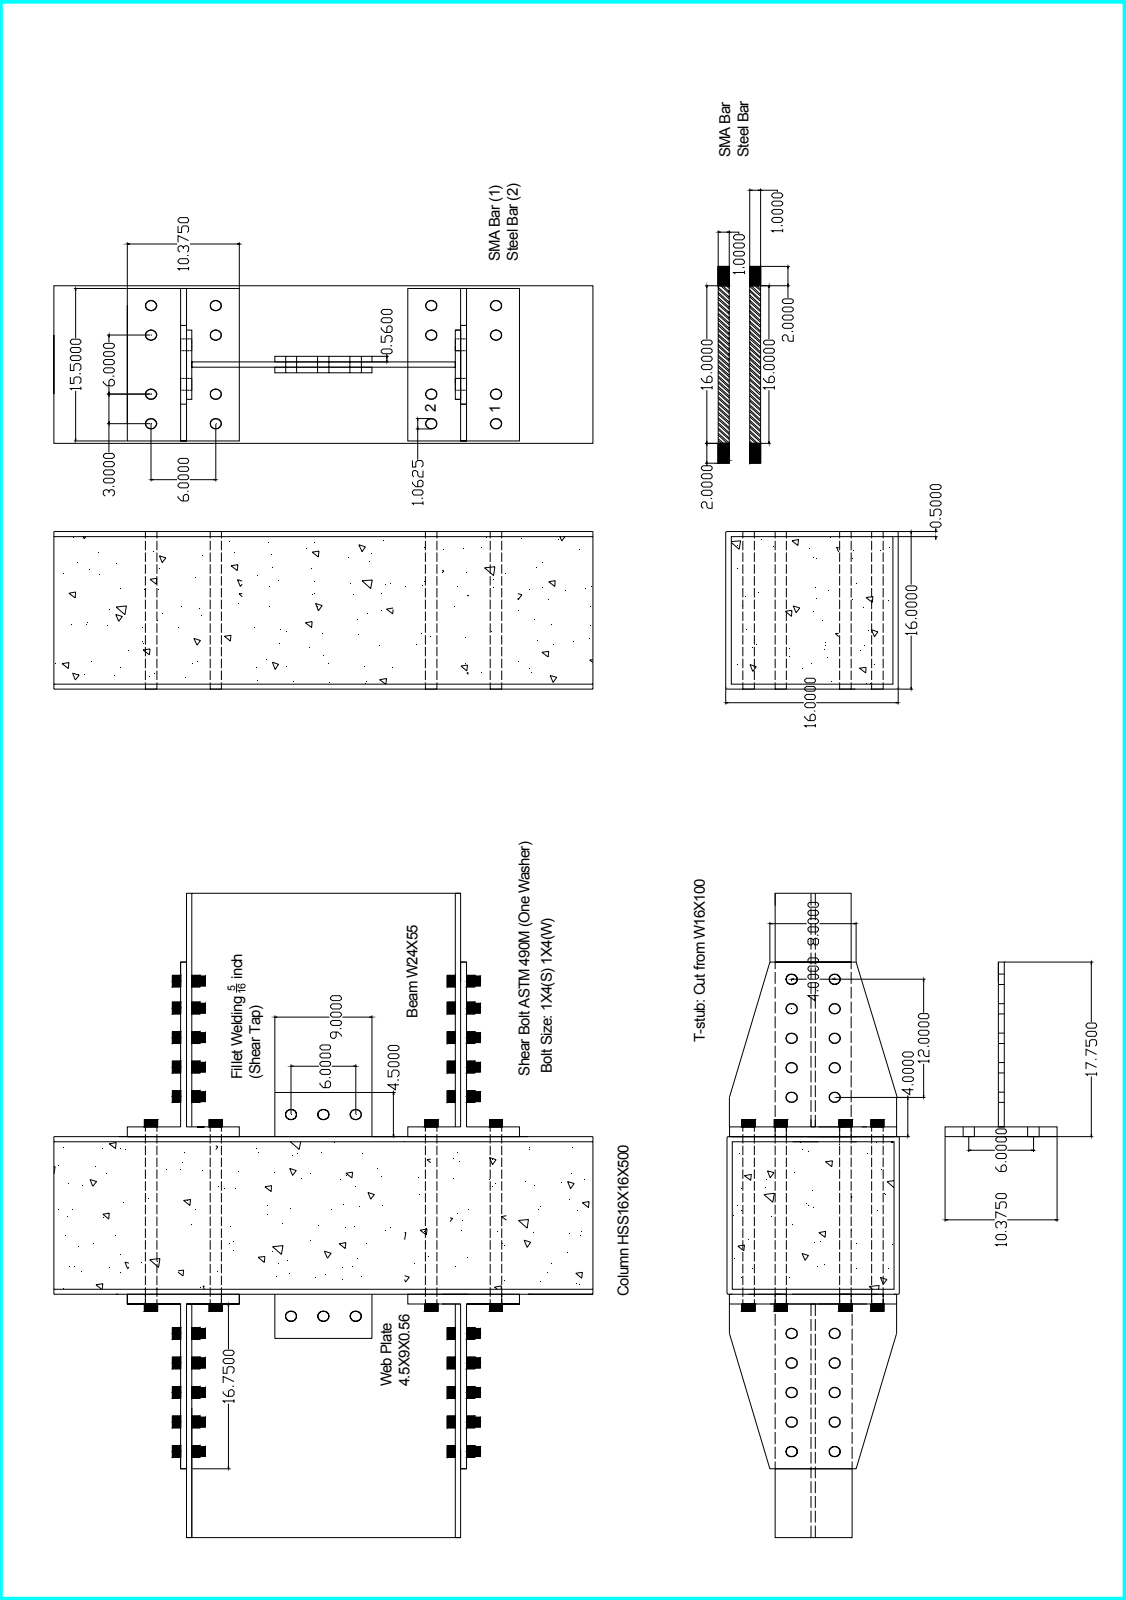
Schematic drawing of RCFT T-stub connection details
